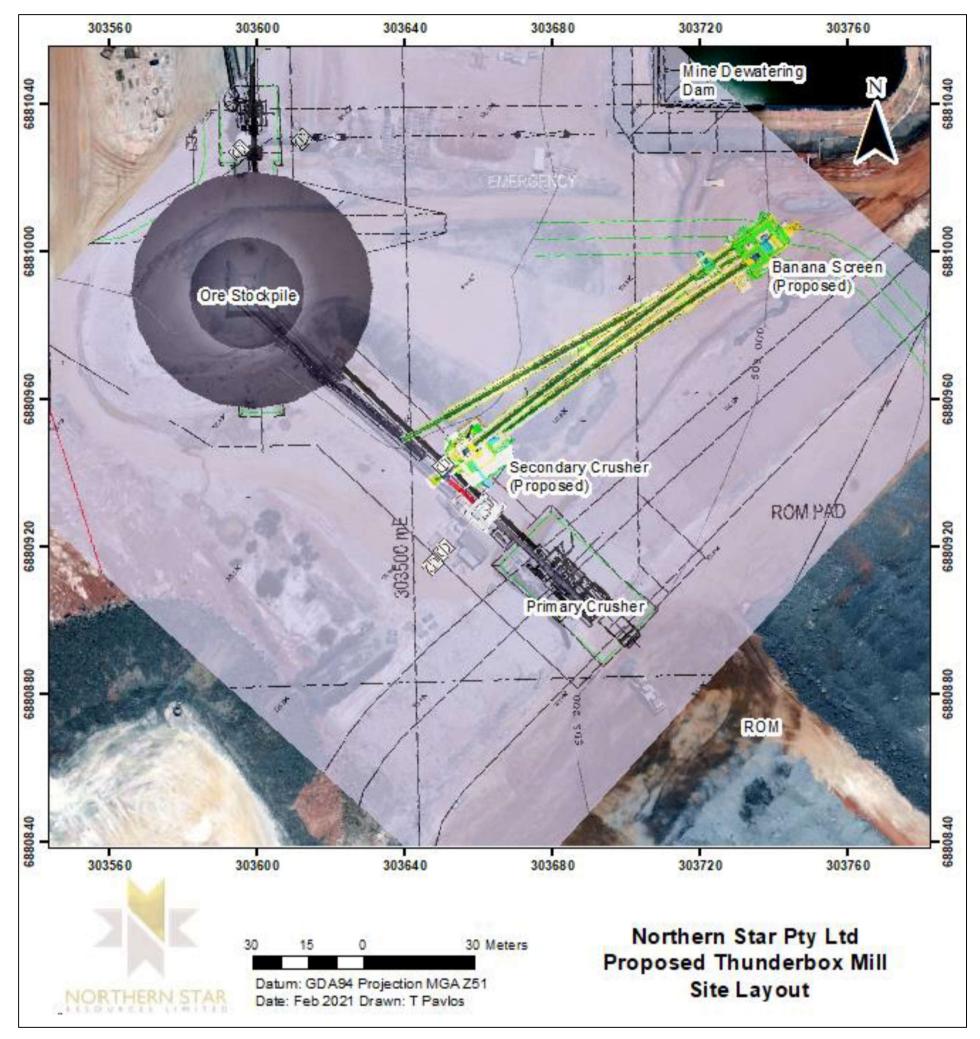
Layout of the secondary crushing circuit infrastructure to be constructed under condition 1.3.13
